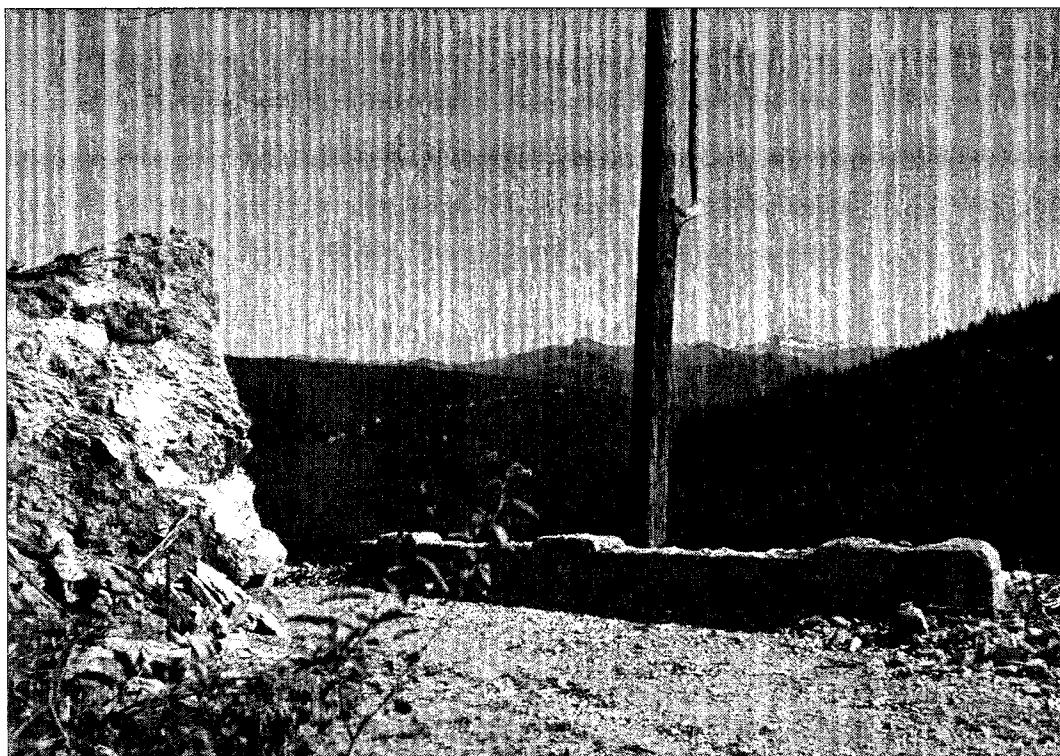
Historic photo showing construction of Type 2 guardwall and retention of snag tree on fill slope in Stevens Canyon, 1940 (MORA Archive).
